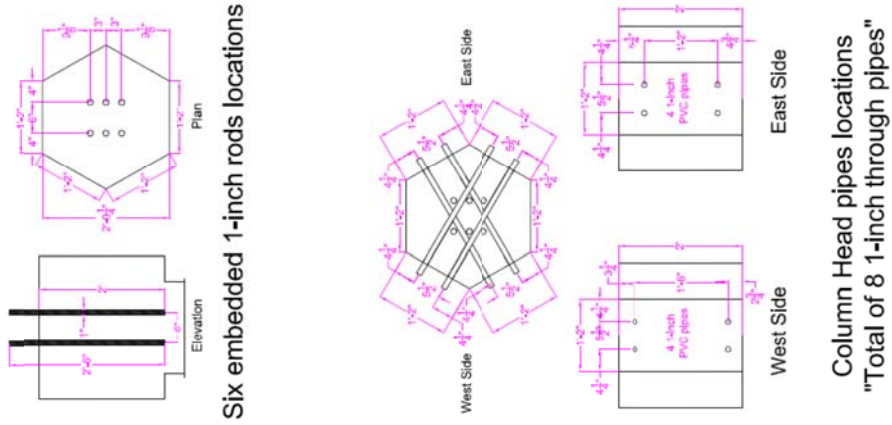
Different views and cross-sections of the column reinforcement and location of construction pipes
